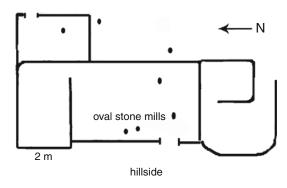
Plan of a well-preserved New Kingdom house in Wadi Talet Gadalla
